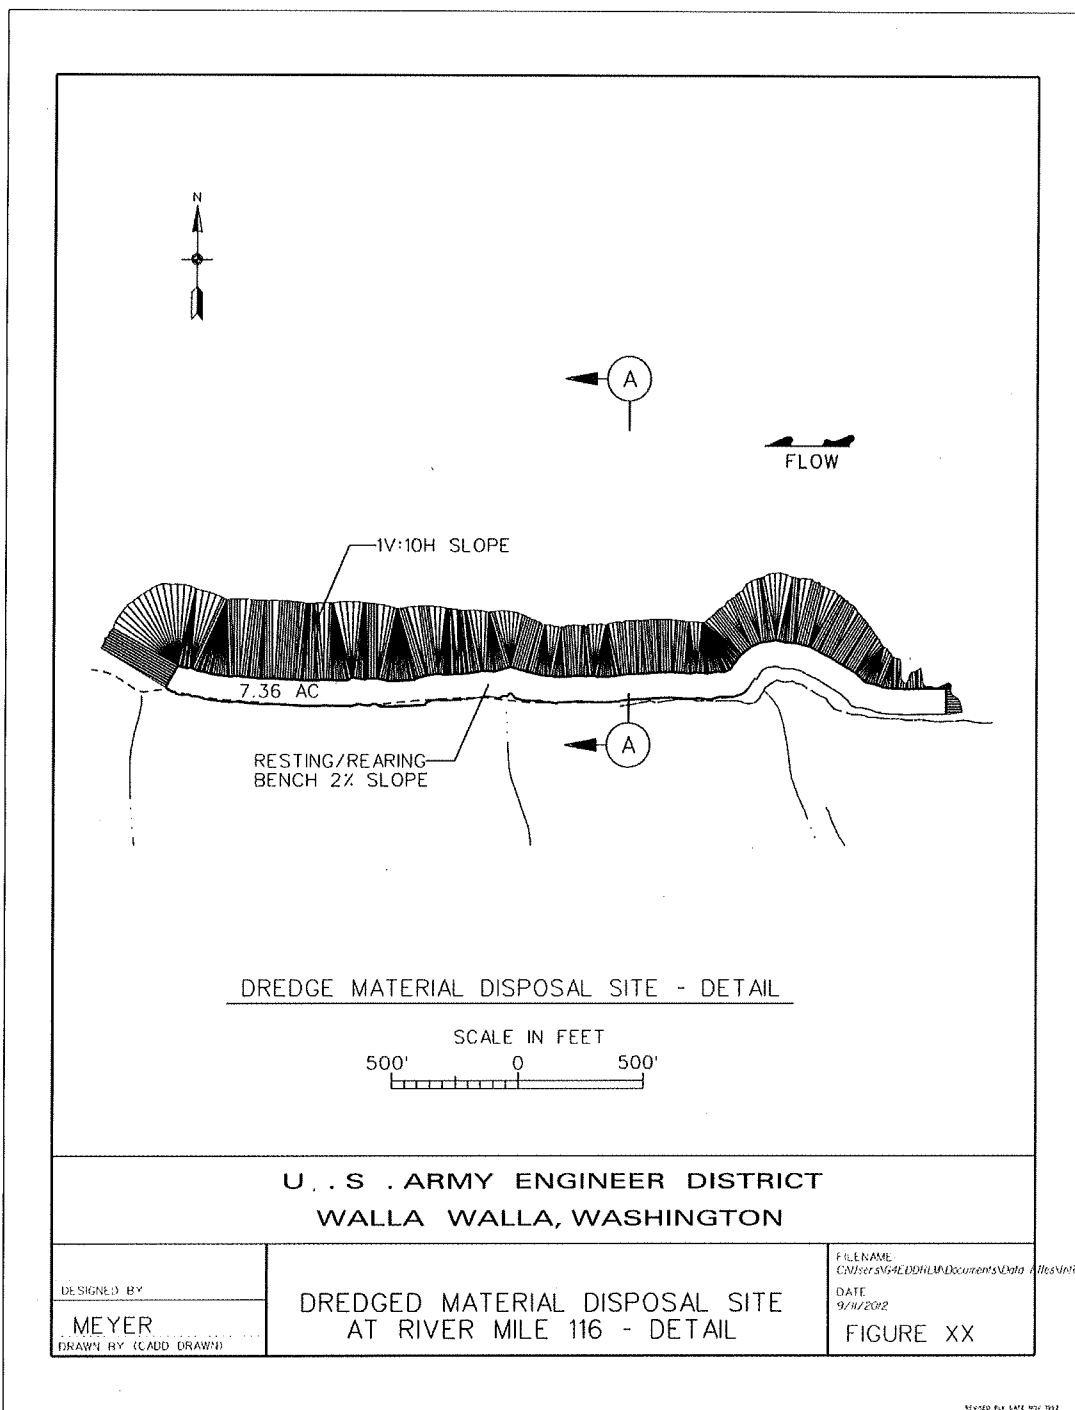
Plan view of disposal site after proposed placement of dredged material in 2013/2014.
